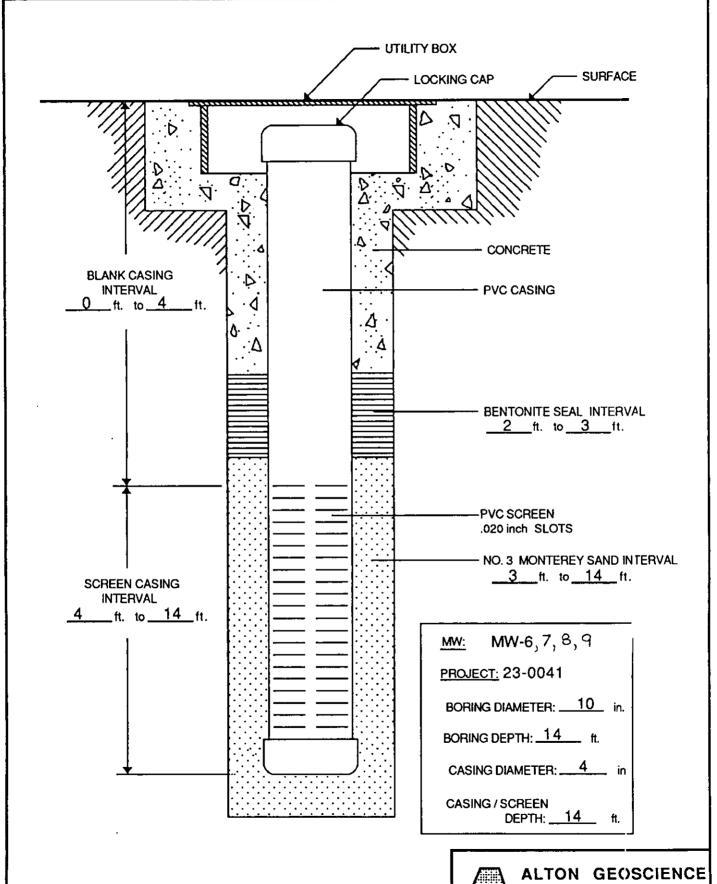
MONITORING WELL CONSTRUCTION DETAIL
